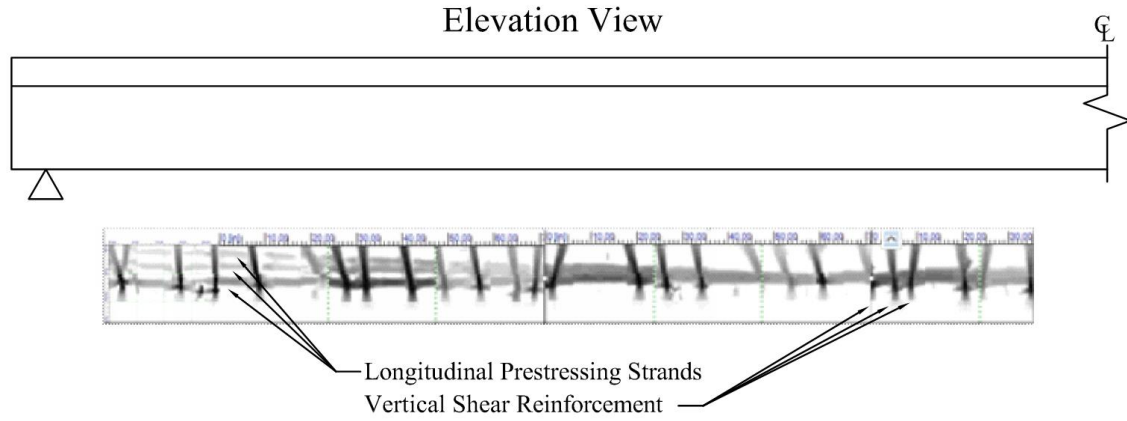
Blockscan of north exterior beam from east abutment to center line (Bridge 7701)
